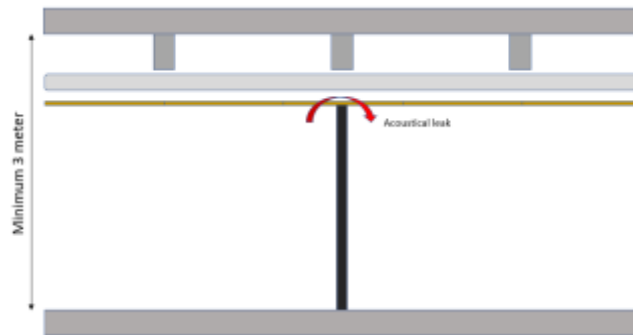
Using a lowered ceiling can cause acoustical leaks and requires a minimum floor-to-floor height
